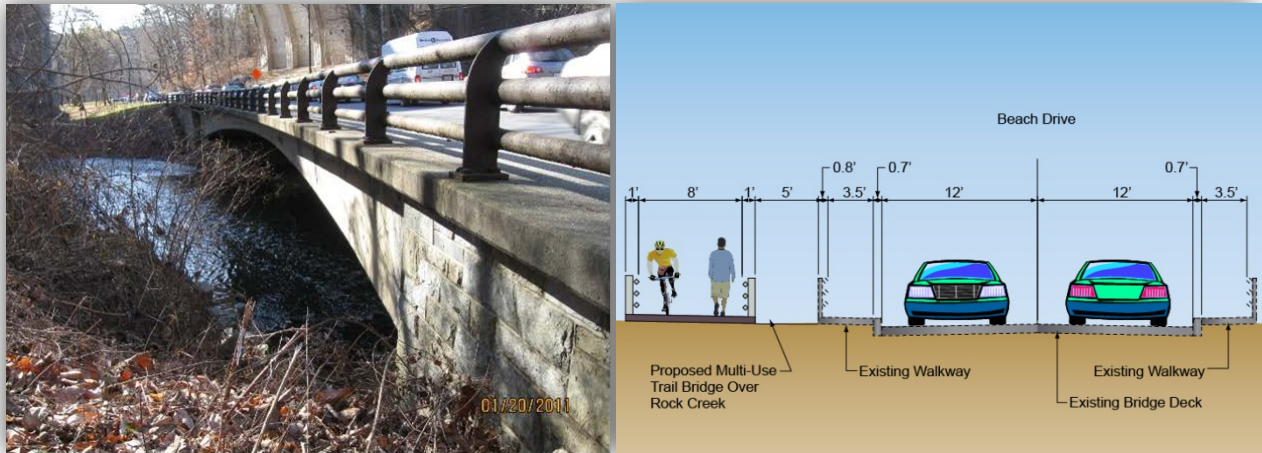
Beach Drive Bridge Existing Conditions and Proposed Conditions
